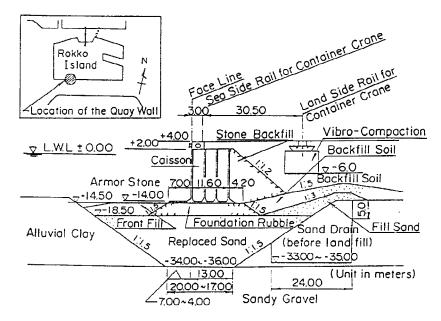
Cross section of a caisson type quay wall at Kobe Port
